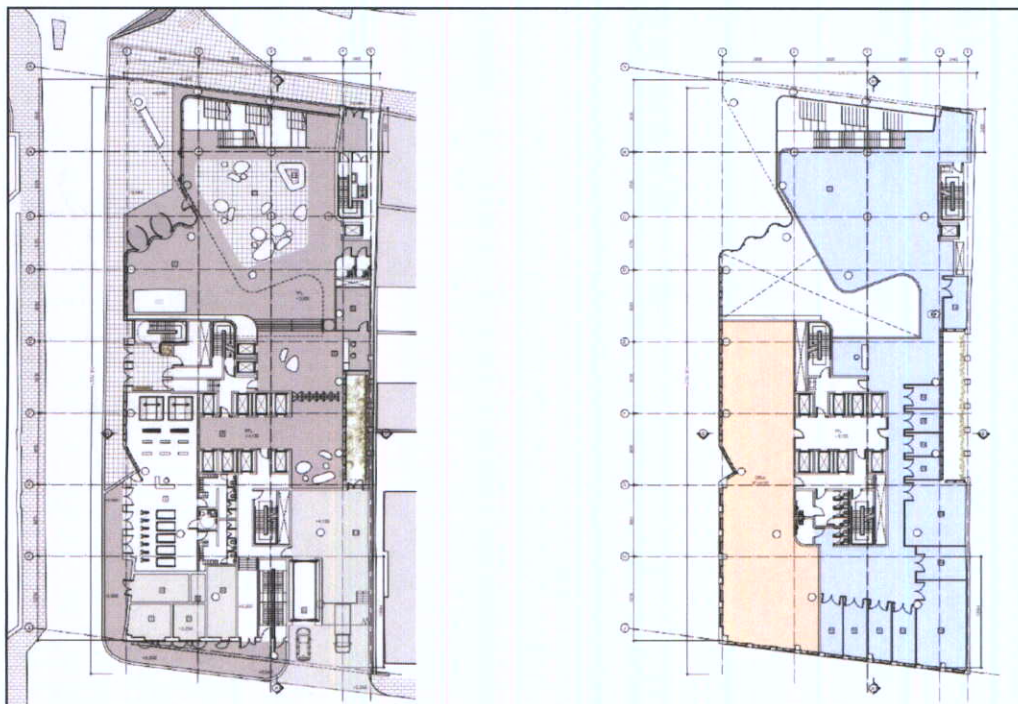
Ground Floor and First Floor Plan (Mahoney Architecture 2022)
